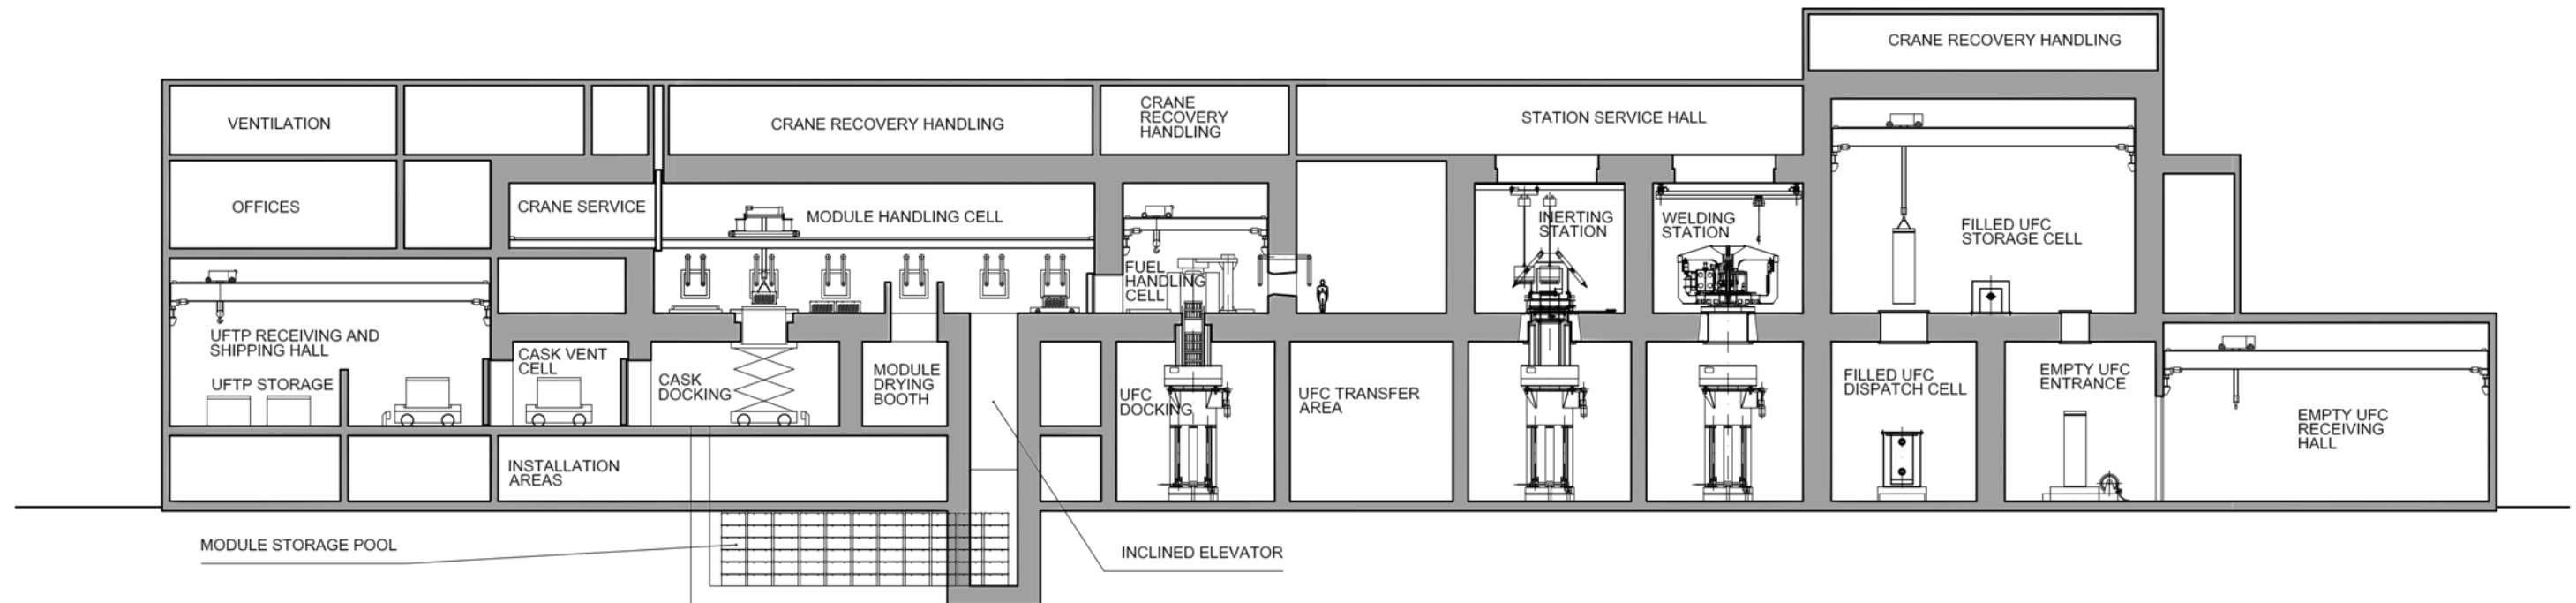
Used Fuel Packaging Plant – Cross-Section
